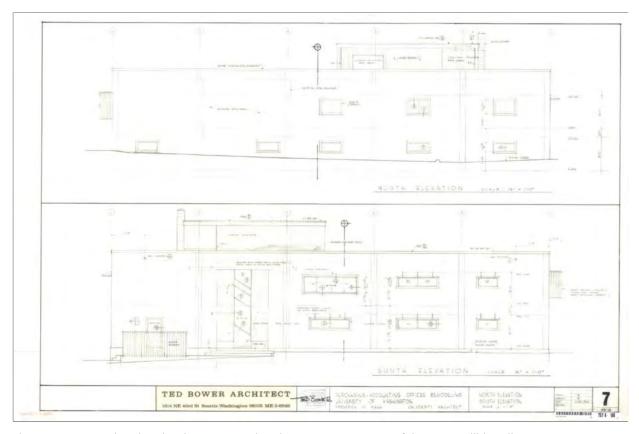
1964 Elevation drawings, 3917 University Way NE, courtesy of the UW Facilities Library.
